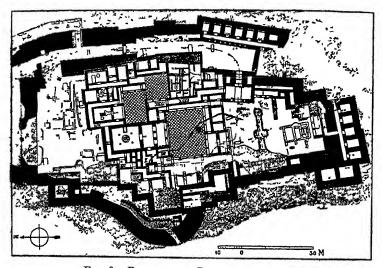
PLAN OF THE PALACE AT TIRYNS
